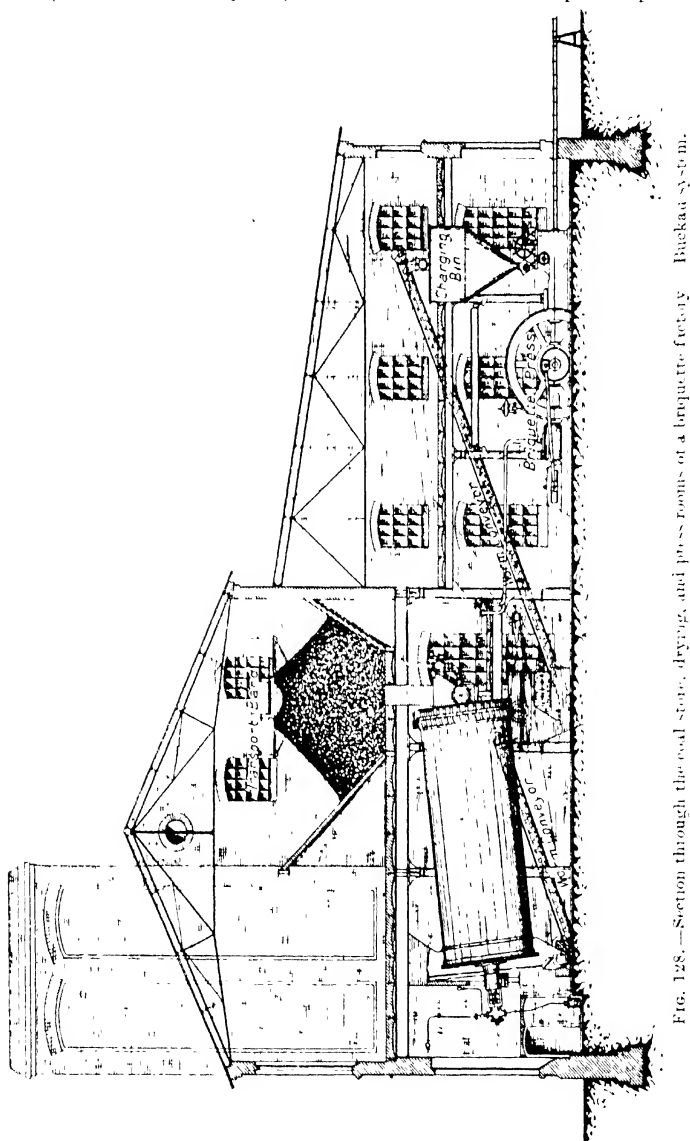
Section through the coal store, drying, and press rooms of a briquette factory. Buckau system.
